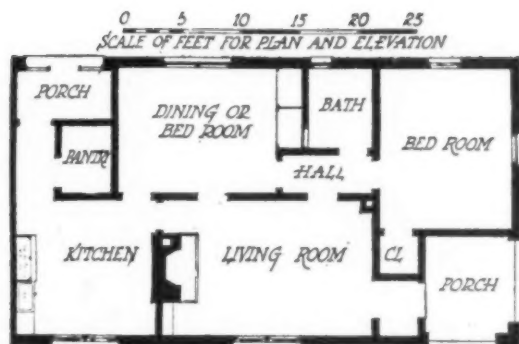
FLOOR PLAN OF ONE-HALF OF 4-ROOM DOUBLE DWELLING FOR AMERICAN LABOR.
